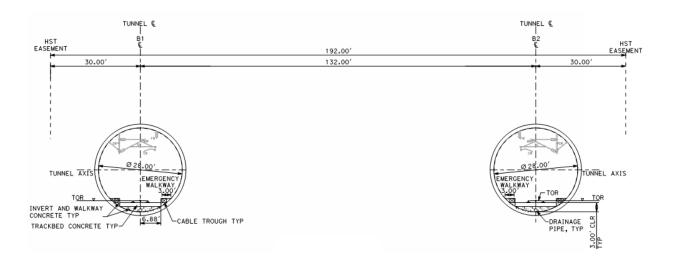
Typical Sections in Subsection Pacheco Pass (Tunnel)
